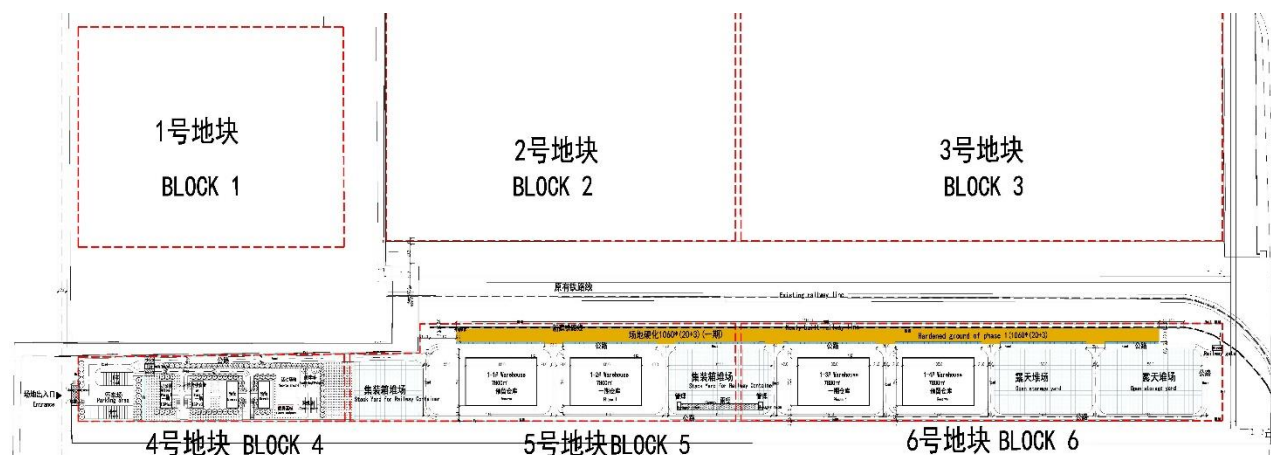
Base layout showing location of the new 1km long railway line, 4 open storage areas, 4 warehouses, office/residential area (block 4) and future expansion area (blocks 1-3). No ancillary facilities outside the 3 blocks 4-6 are planned.
